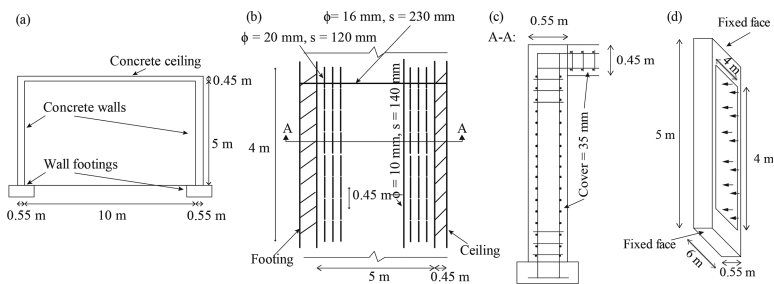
(a) Dimensions of the elements in the frame structure; (b) reinforcement for the wall and ceiling; section showing the wall thickness, ceiling thickness and cover; and (d) the idealized case used for design of the reinforcement.
